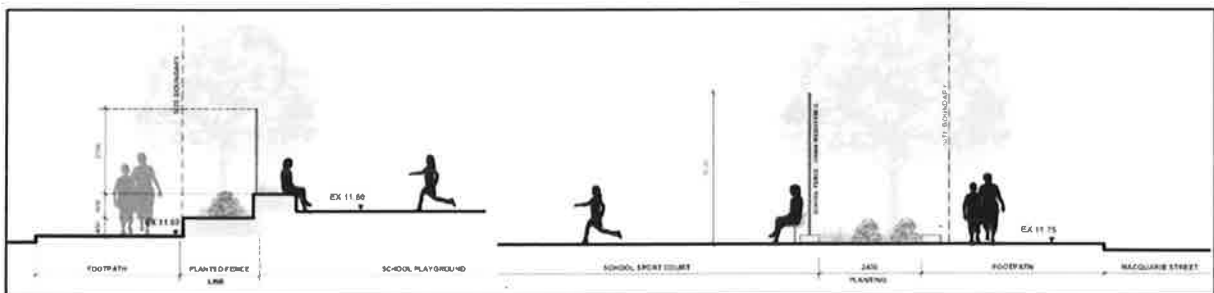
Cross Section of Perimeter Fencing Design with Planter (source: Applicant)
